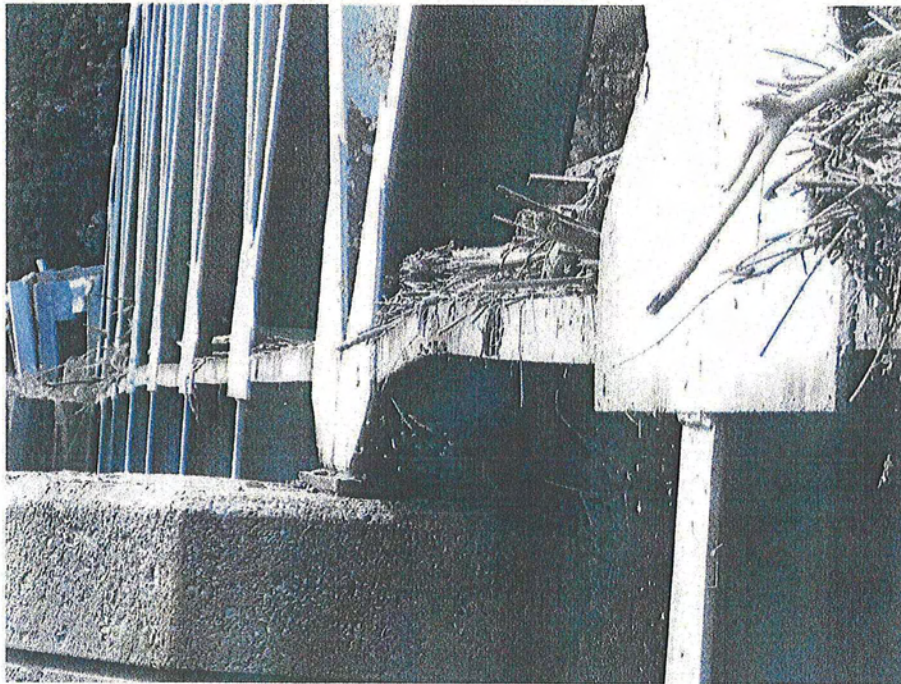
Damaged L₆'-U₅' span 2, west truss.
